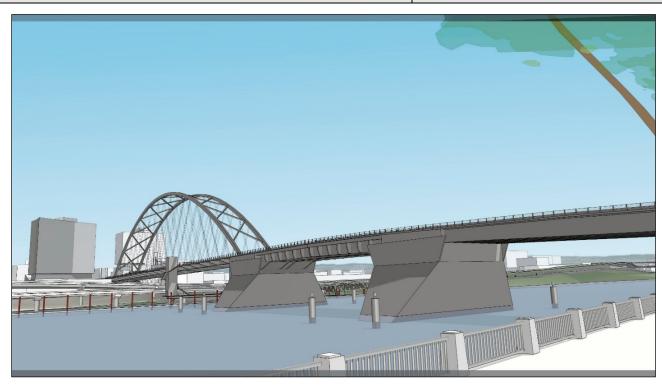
Span Combination 1 (girder west approach, bascule central span, tied arch east approach), artist's rendering, view looking southeast (Fat Pencil Studio, 2021).
